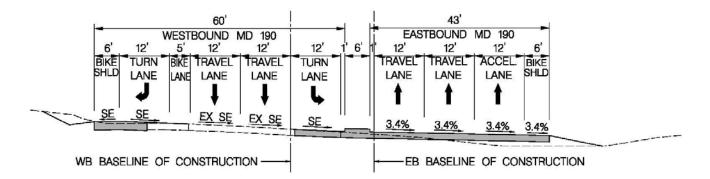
Alternative 3 - MD 190 Intersection East of Pyle Road
